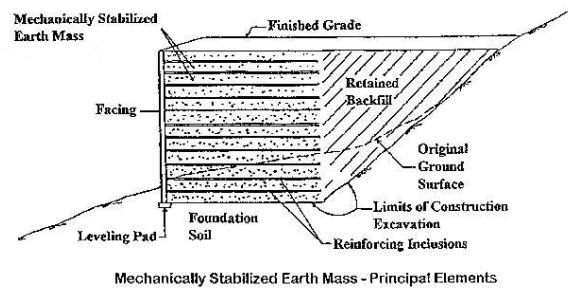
Schematic cross section of an MSE wall (FHWA-NHI-00-043)
